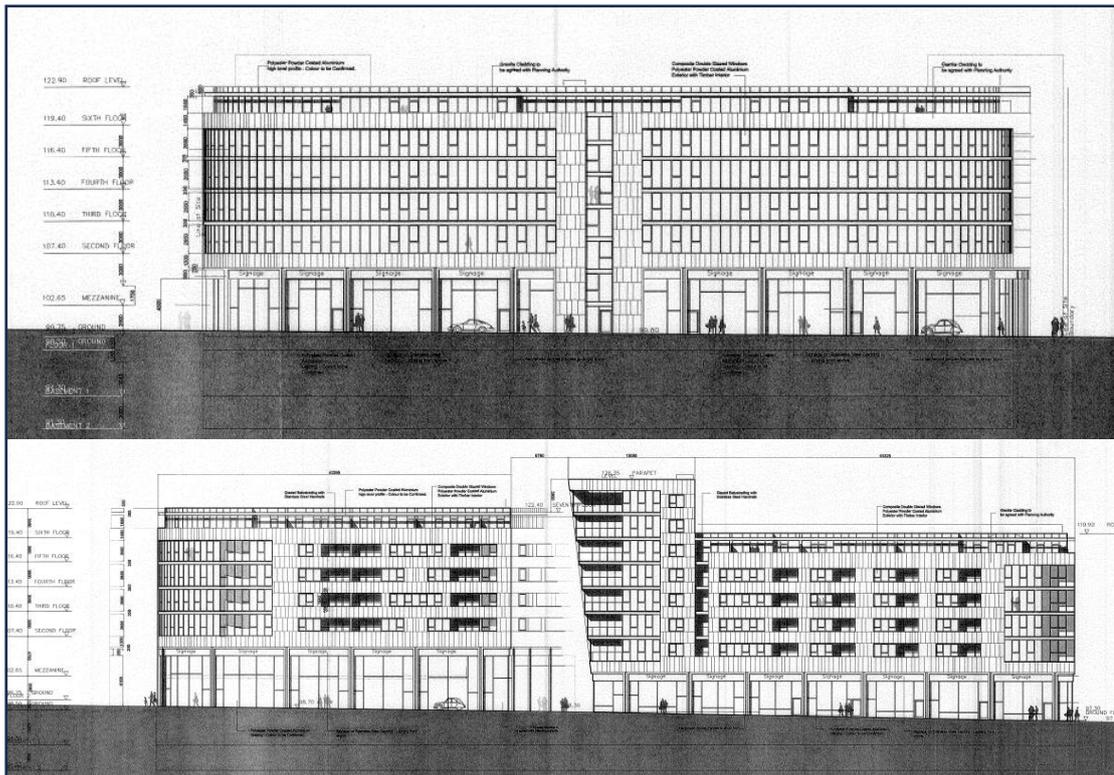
North Elevation (Top) and West Elevation (Bottom), of the Granted Scheme.
